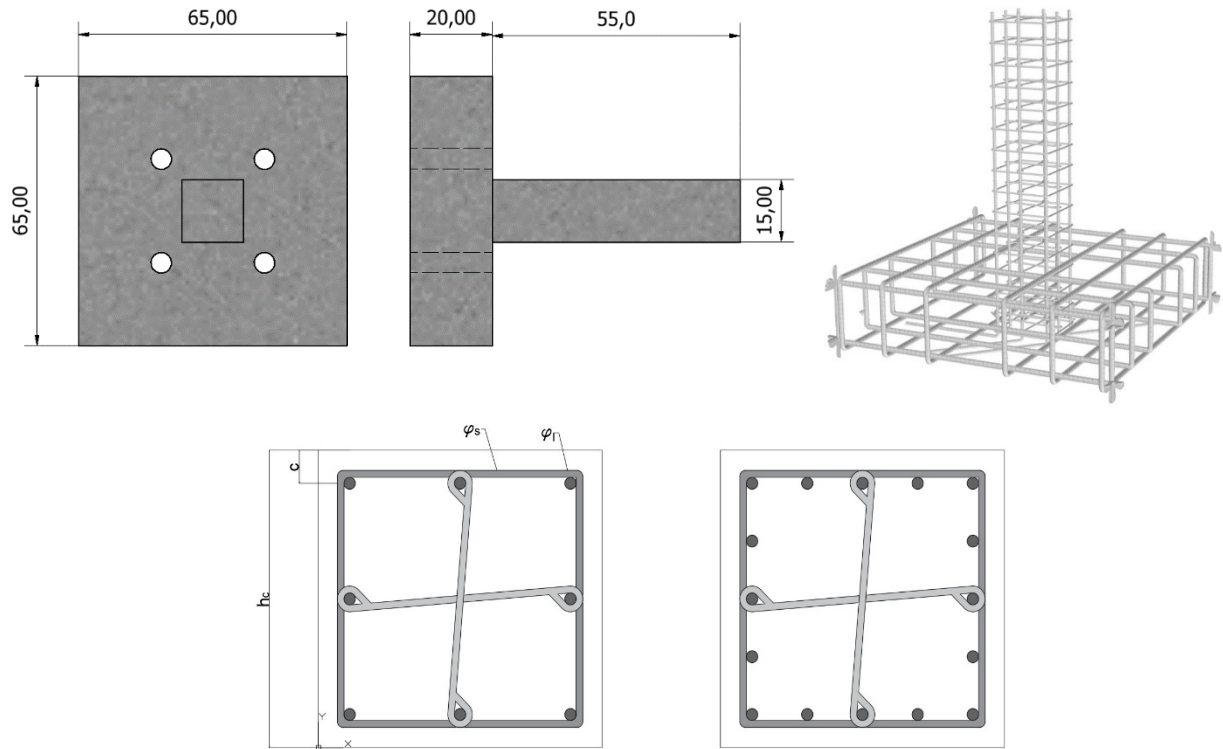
Top: Specimen dimensions and reinforcement. Bottom: Reinforcement layout for the specimens having lighter (left) and heavier (right) longitudinal reinforcement.
